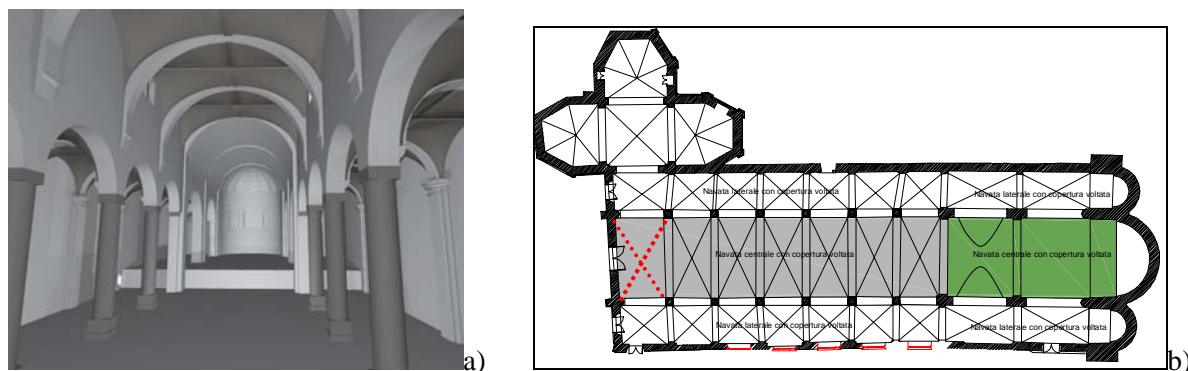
Reconstructed computer rendered view a) and plan of the church b) in XX century.
